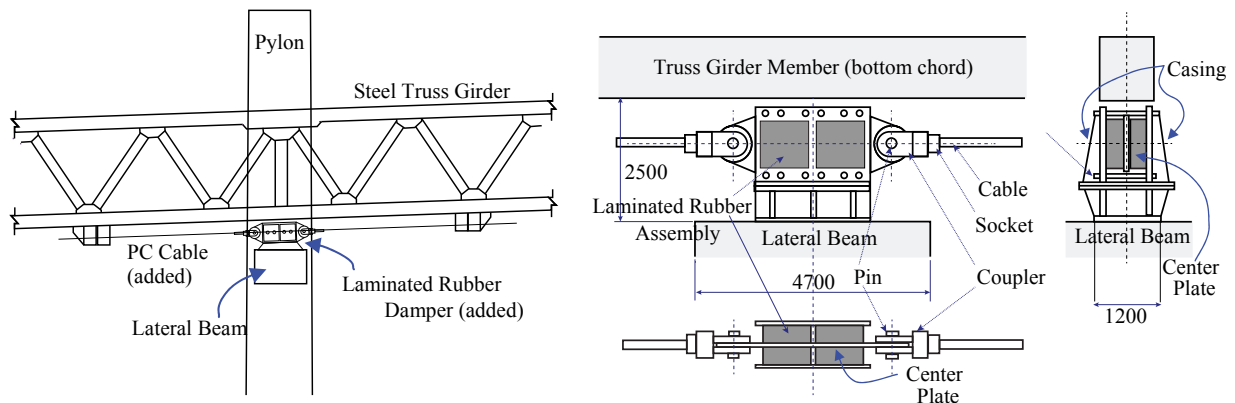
Retrofit of cable-stayed bridge with laminated rubber dampers
